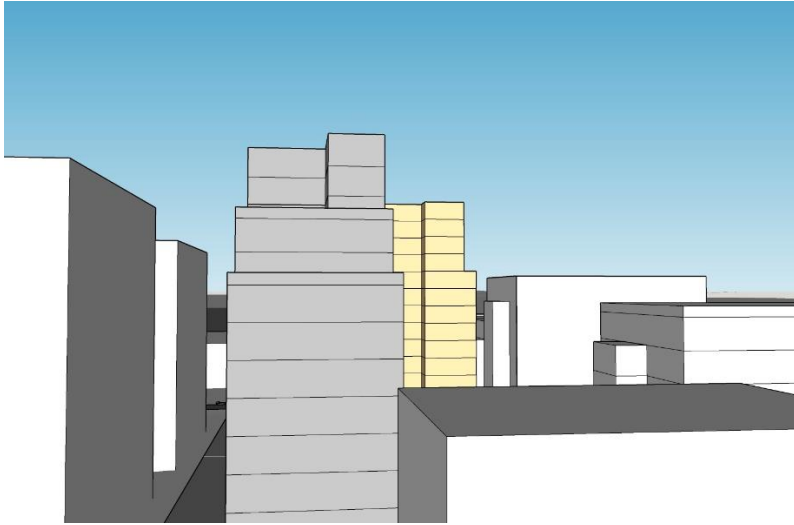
Impact of Building A – View obstructed (Source: Squillace Architects)
